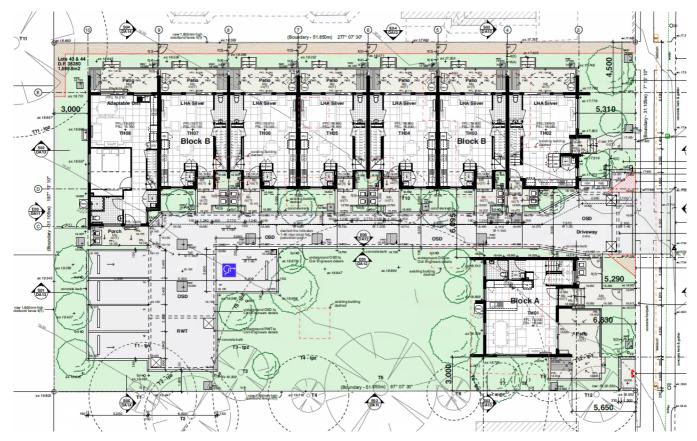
Extract from Architectural Plans (ground floor) (Source – Stanton Dahl Architects, dated 19/02/2024)
